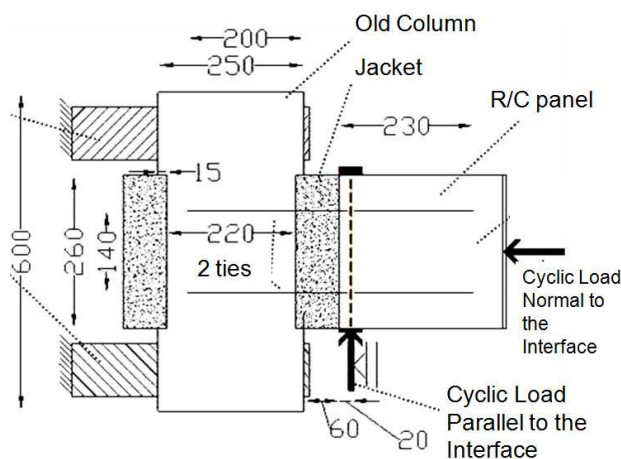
Loading arrangement of the specimen representing portion of encased R/C panel and the jacketed column
